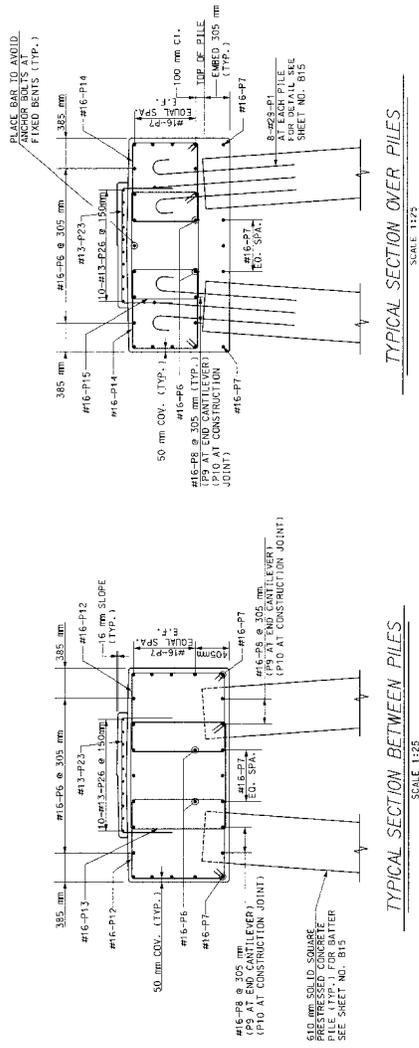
Pile Bent Section Between Piles and Over Piles Stage II
